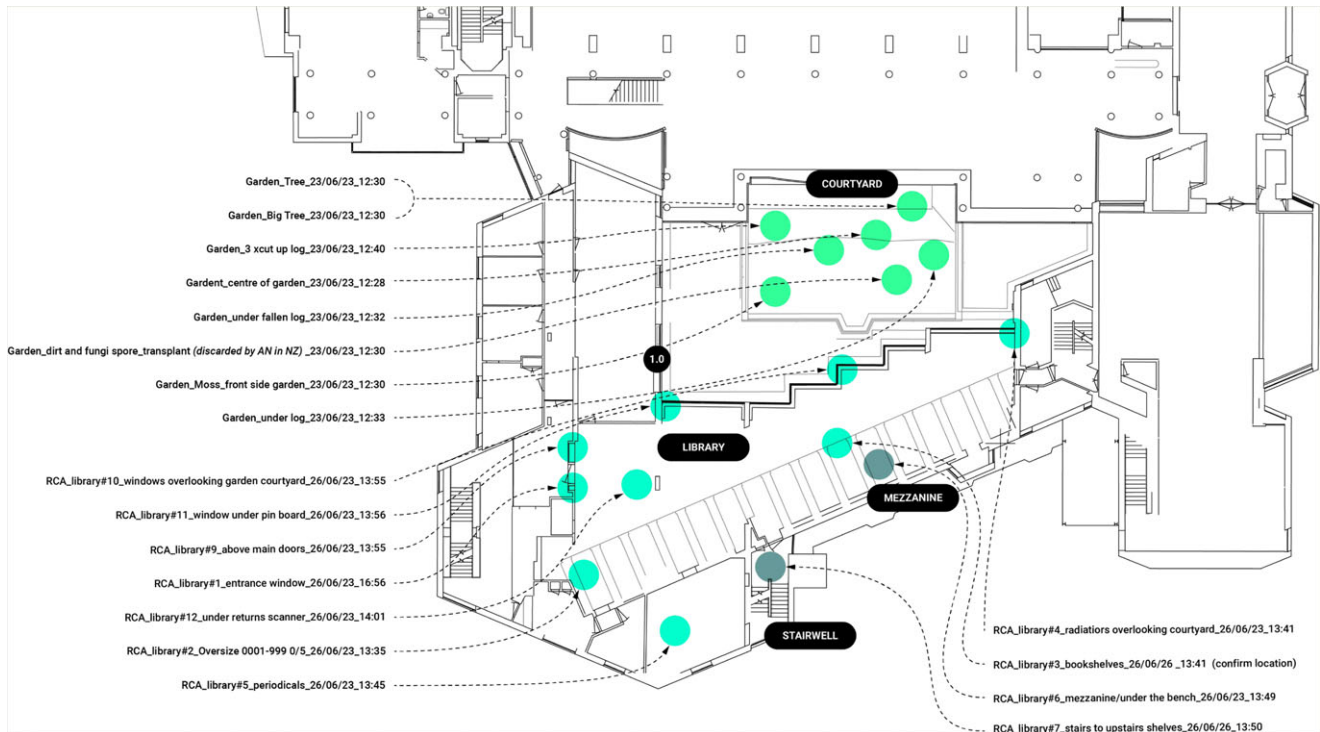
Floor plan indicating the locations of dust collection and agar plate placements.
